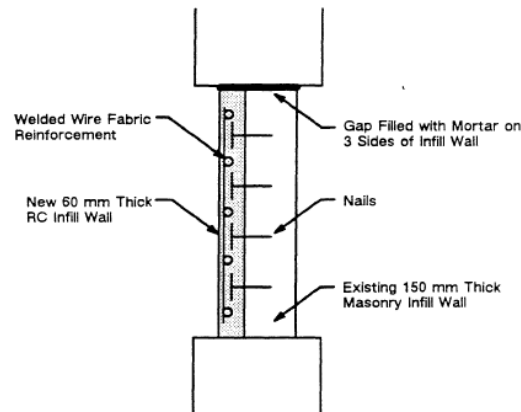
Wall reinforcement detail (Downs, et al., 1991)
